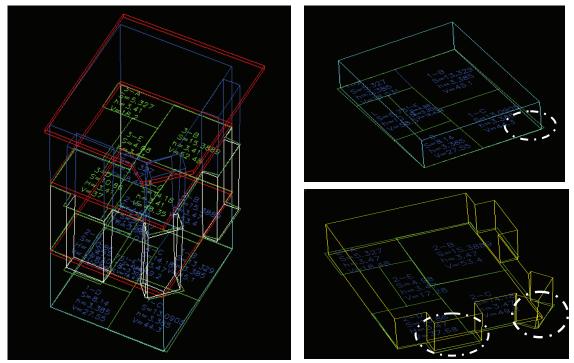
The result of the model integration. All apartment units within one building object (left); the ground floor (upper right); the second floor (lower right). Note the differences of the overhanging structure between two floors.
